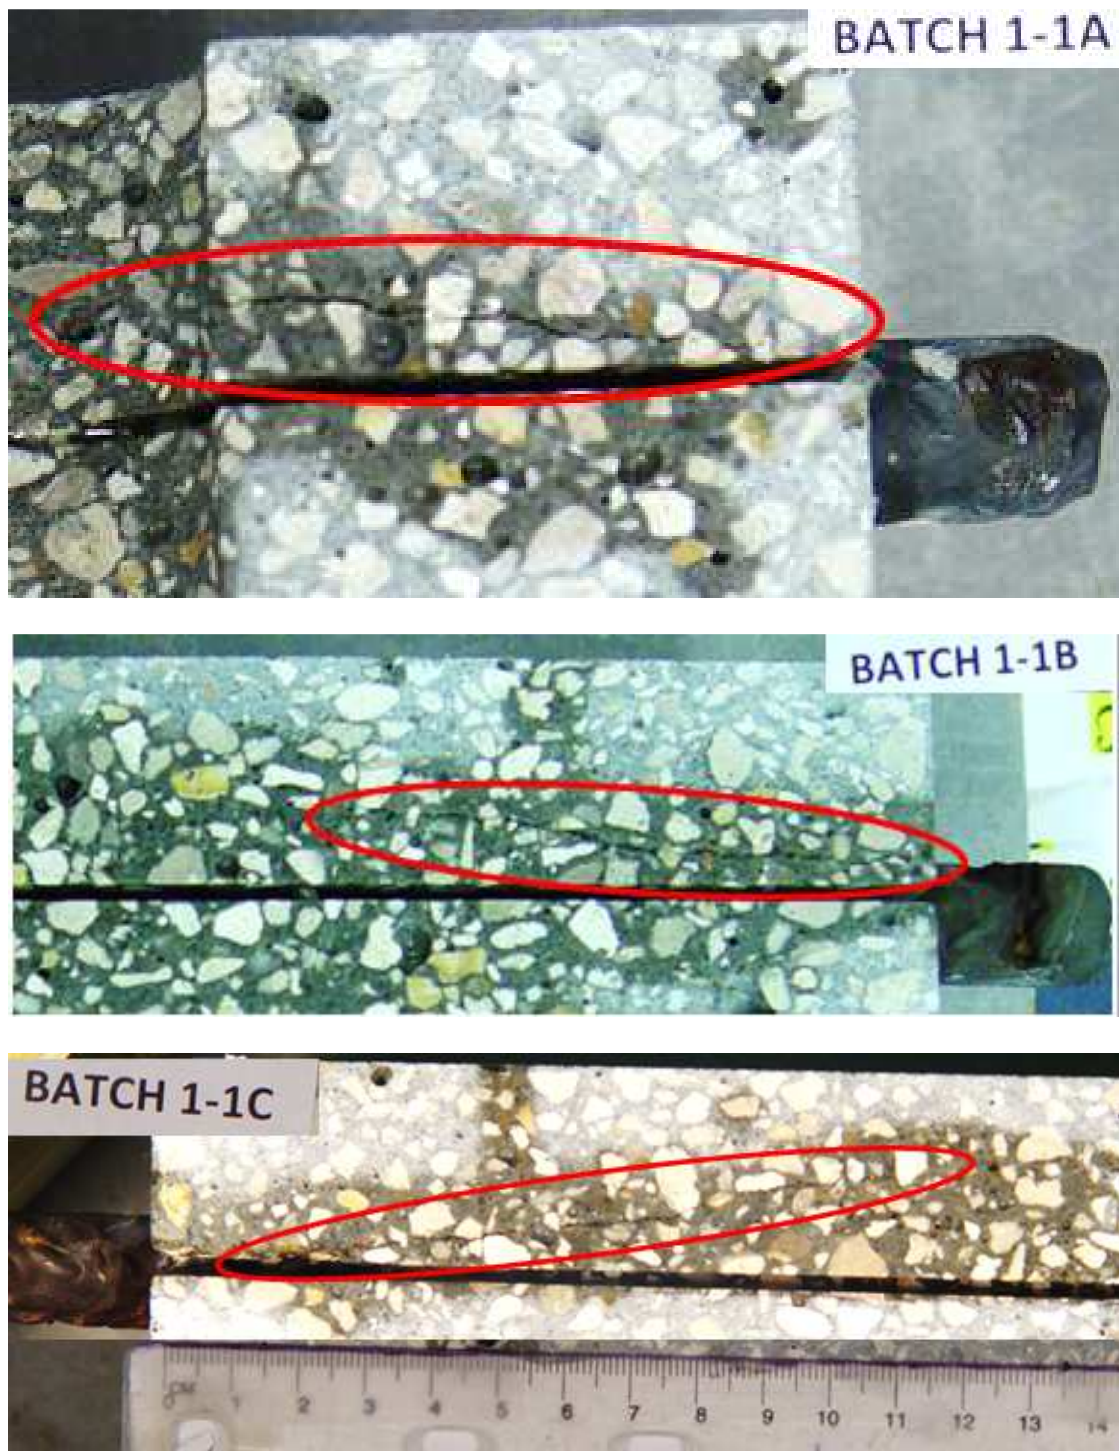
Lateral cracks pictures for specimen Batch 1-1
